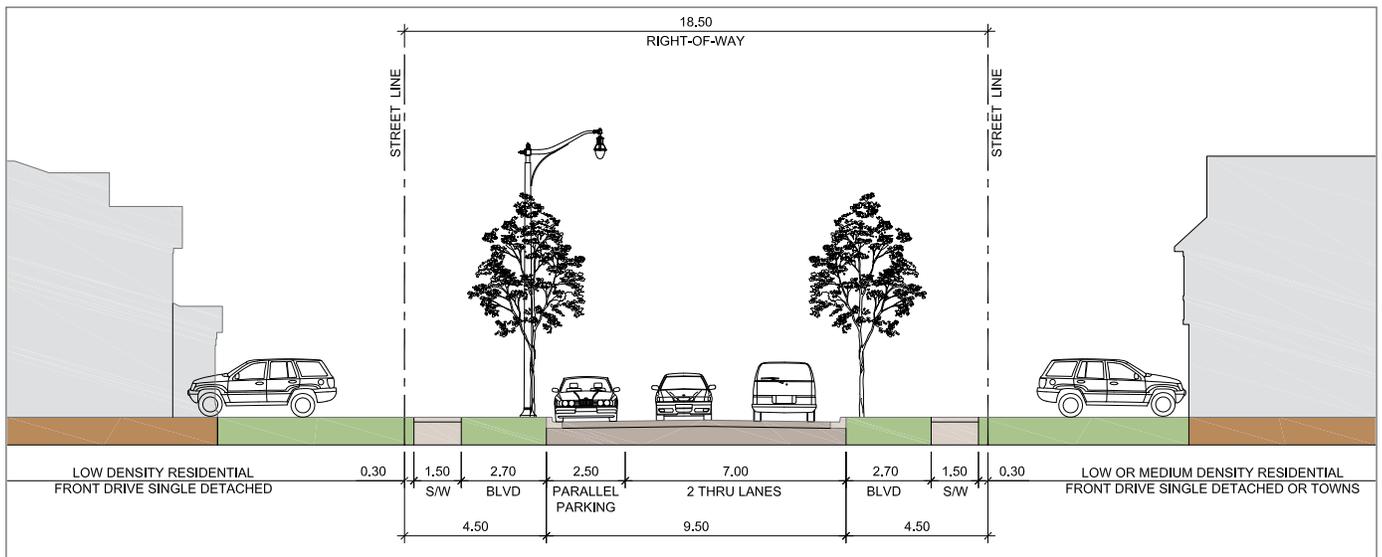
Local Road with Parking - 18.5m R.O.W. Cross-section
